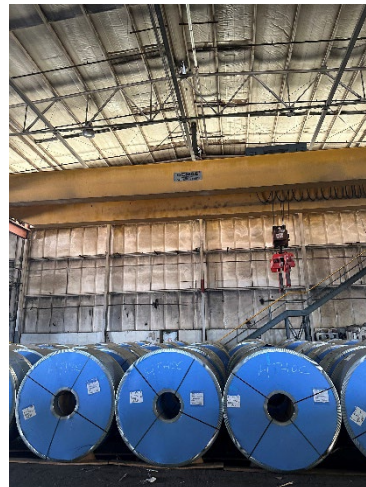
Typical girt framing along South elevation in fair/good condition. Clean and paint
